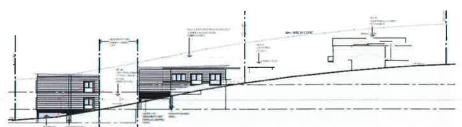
Locksley Street elevation noting that the built form in the middle of the site is not shown in this elevation (Source: MDP Architects)
